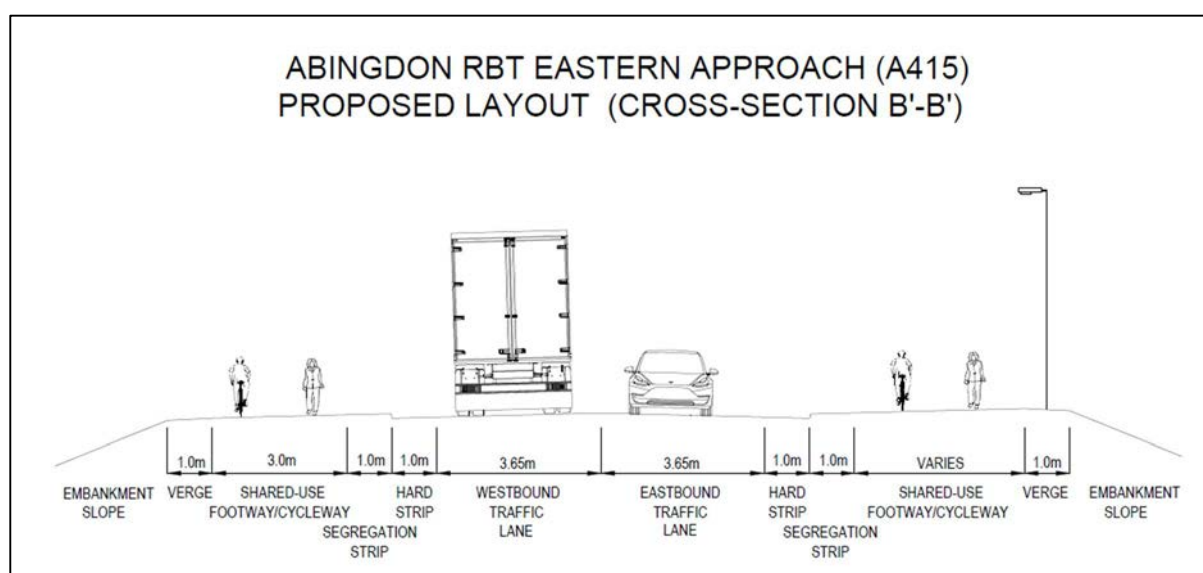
Proposed Layout of Eastern Approach to Abingdon Roundabout
